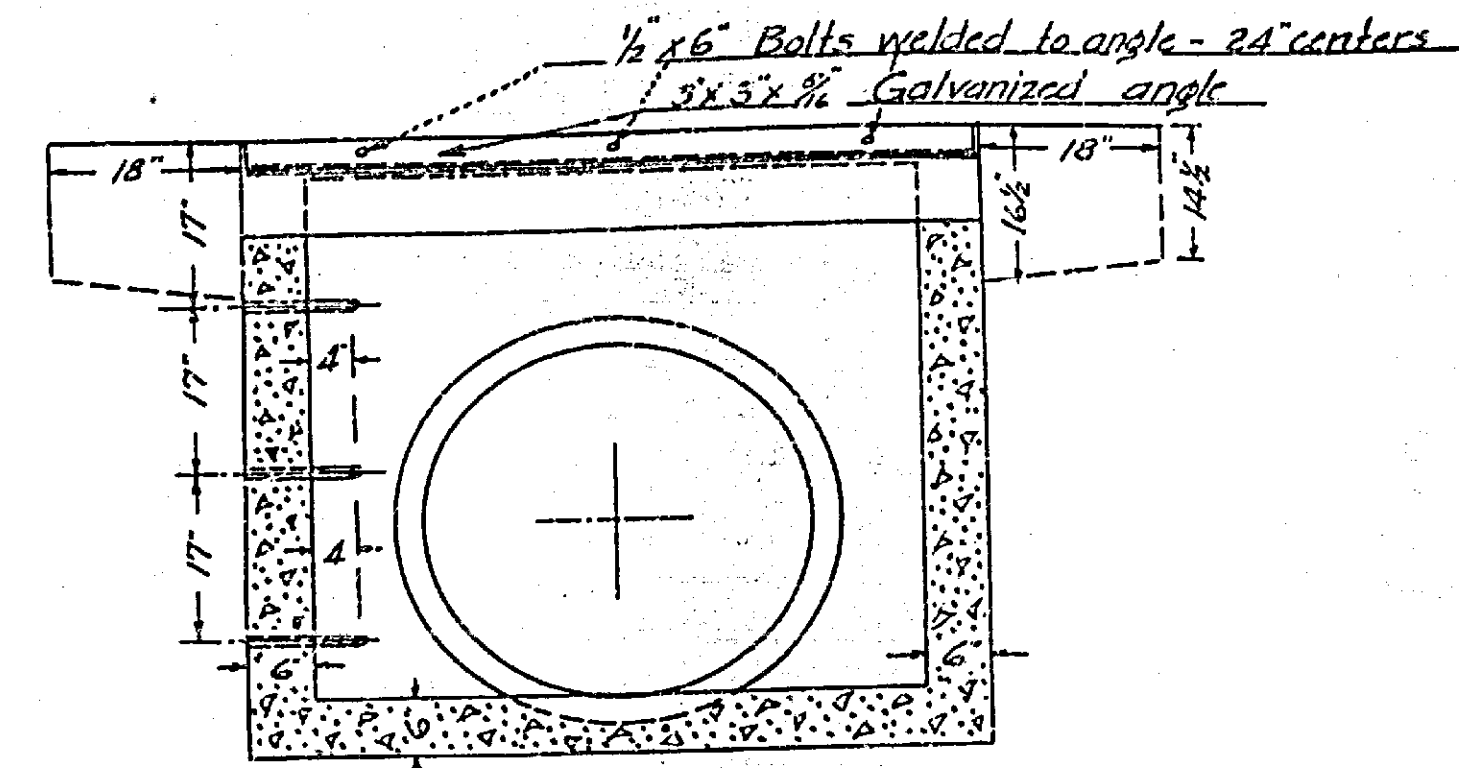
# DETAIL OF REINFORCED CONCRETE CATCH BASINS
